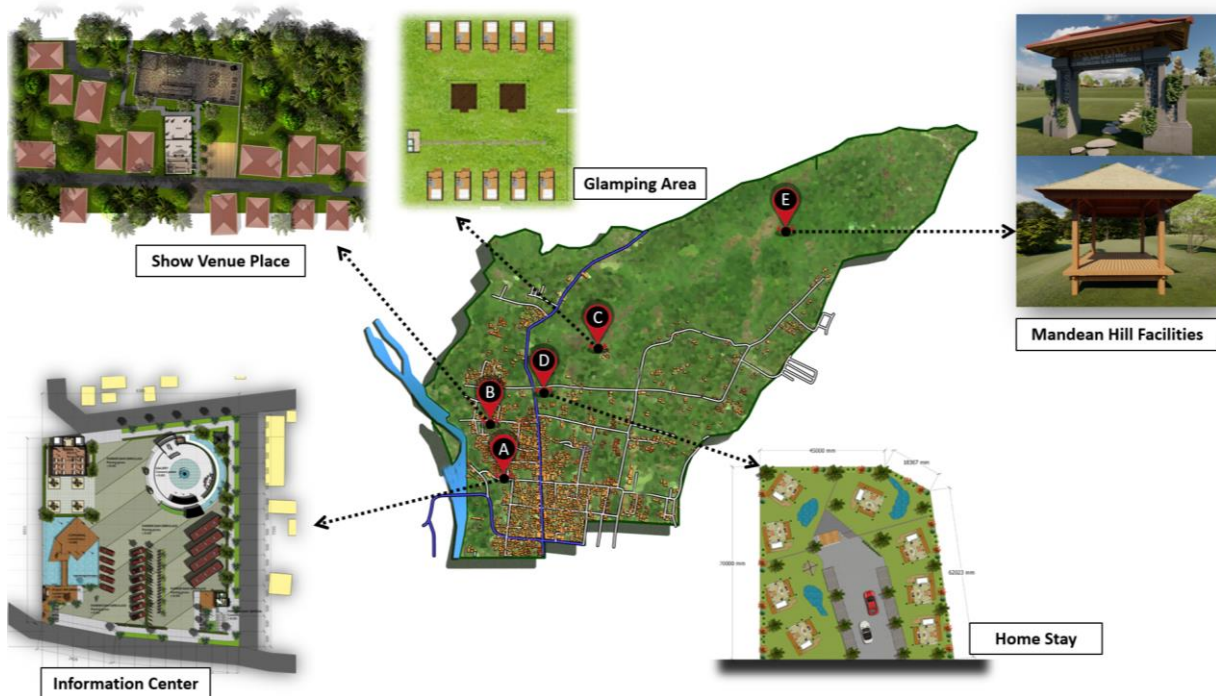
Paksebalı Tourism Village Development Master Plan Planning (Source: Author, 2021)
